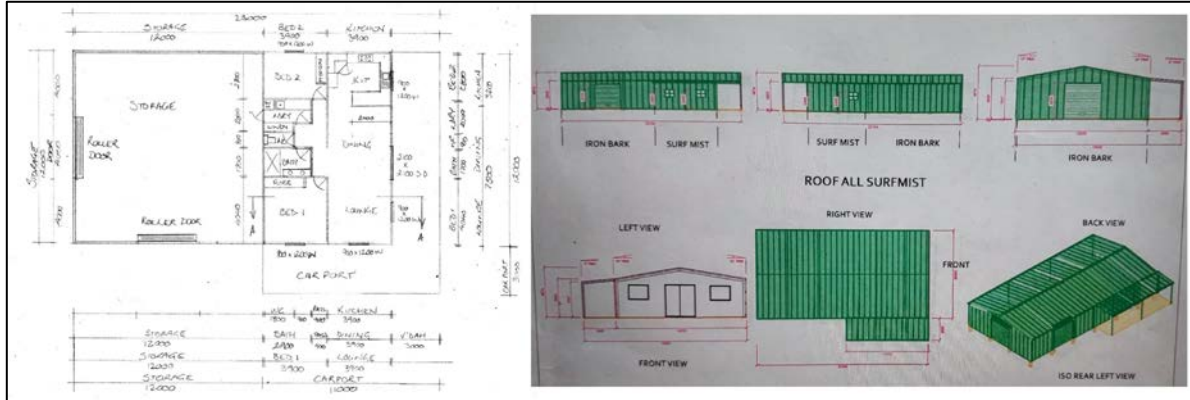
Concept drawing for residence/outbuilding and proposed cladding colours
